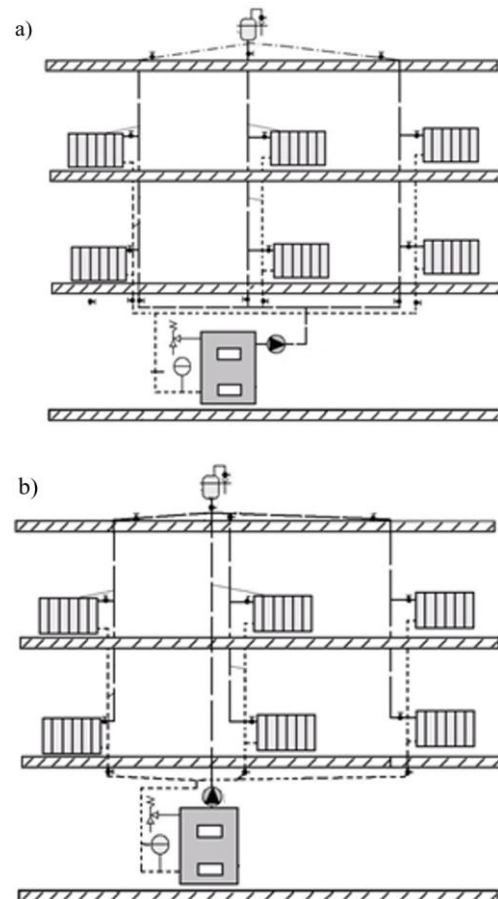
a) single column central heating system, b) multi-column central heating system [19]
